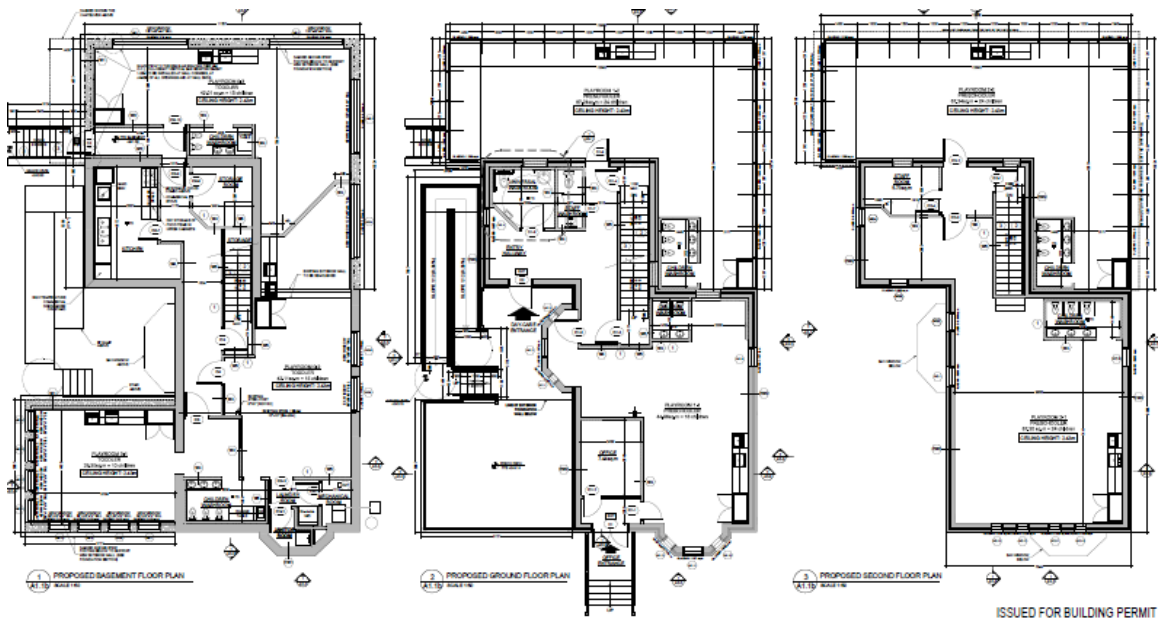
Floor Plans, Phase 2 Armstrong House Daycare (AREA, Aug. 20, 2024)
